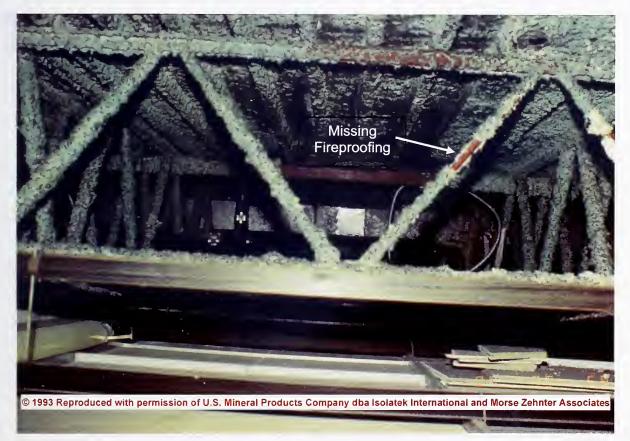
Example of "gap" in fireproofing on diagonal member of a bridging floor truss.
